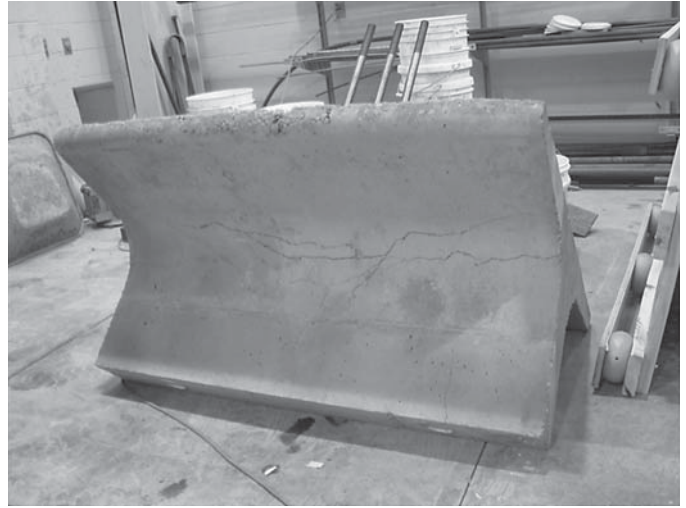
Structural behavior of Group 1 specimen of the slab/concrete girder.
